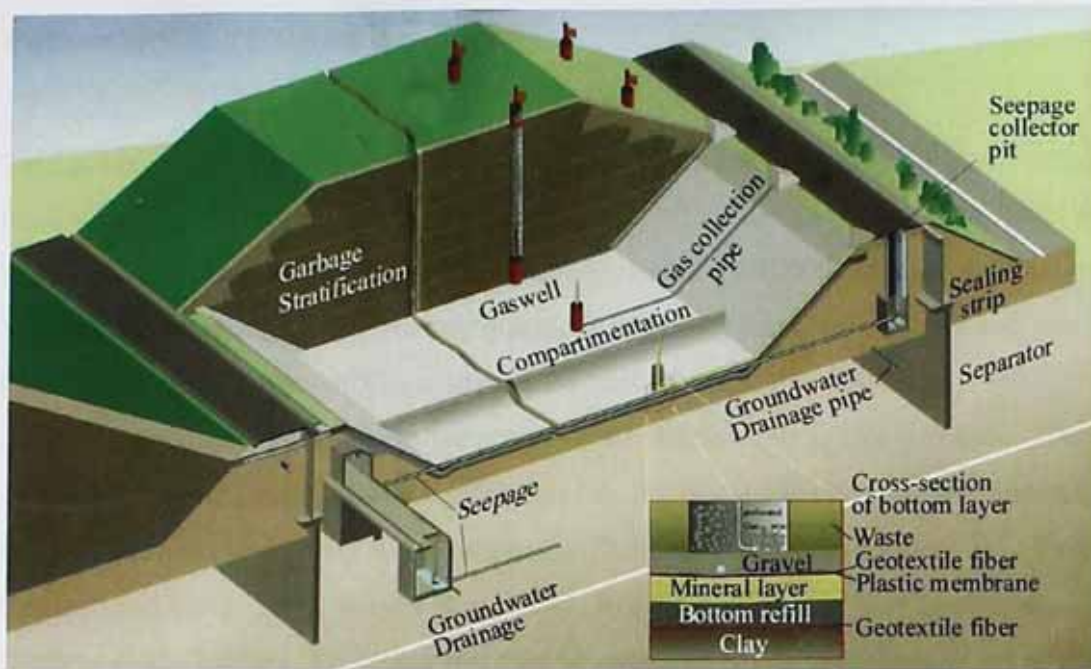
A modern landfill site, showing engineering structures and capped profile (Makel Engineering, 2006).
